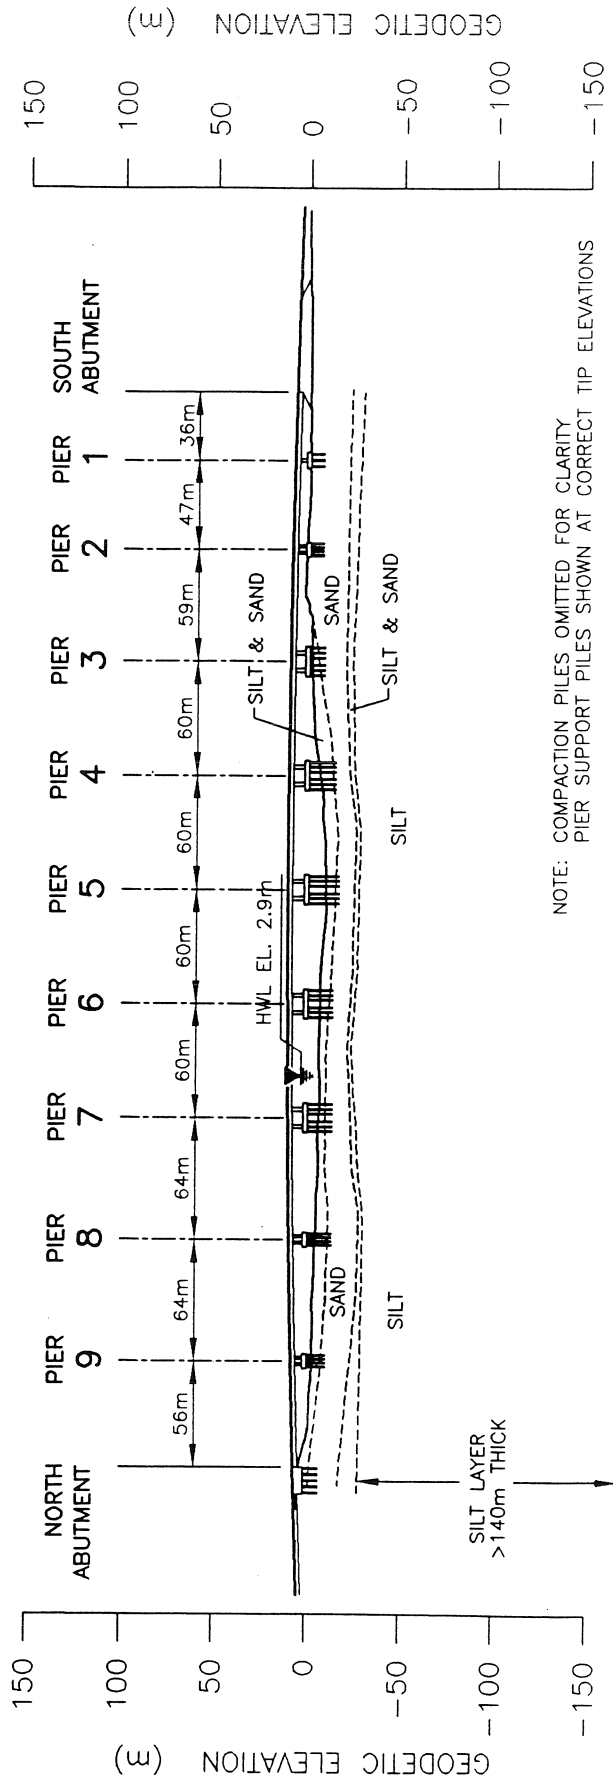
No. 2 Road Bridge - Geological profile on bridge alignment
